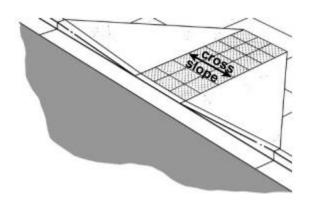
Cross Slope (Source: ADA Accessibility Survey Instructions Manual)
